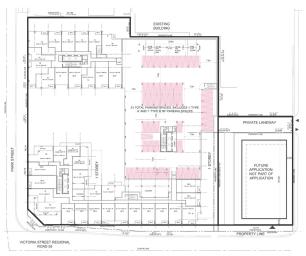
IMAGES: Floor plans of multi-level parking garage (Source: IBI Group, adapted).
